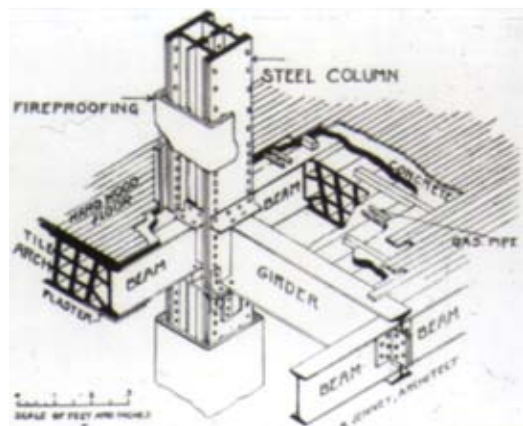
FAIRE STORE, STEEL FRAME AXONOMETRIC
